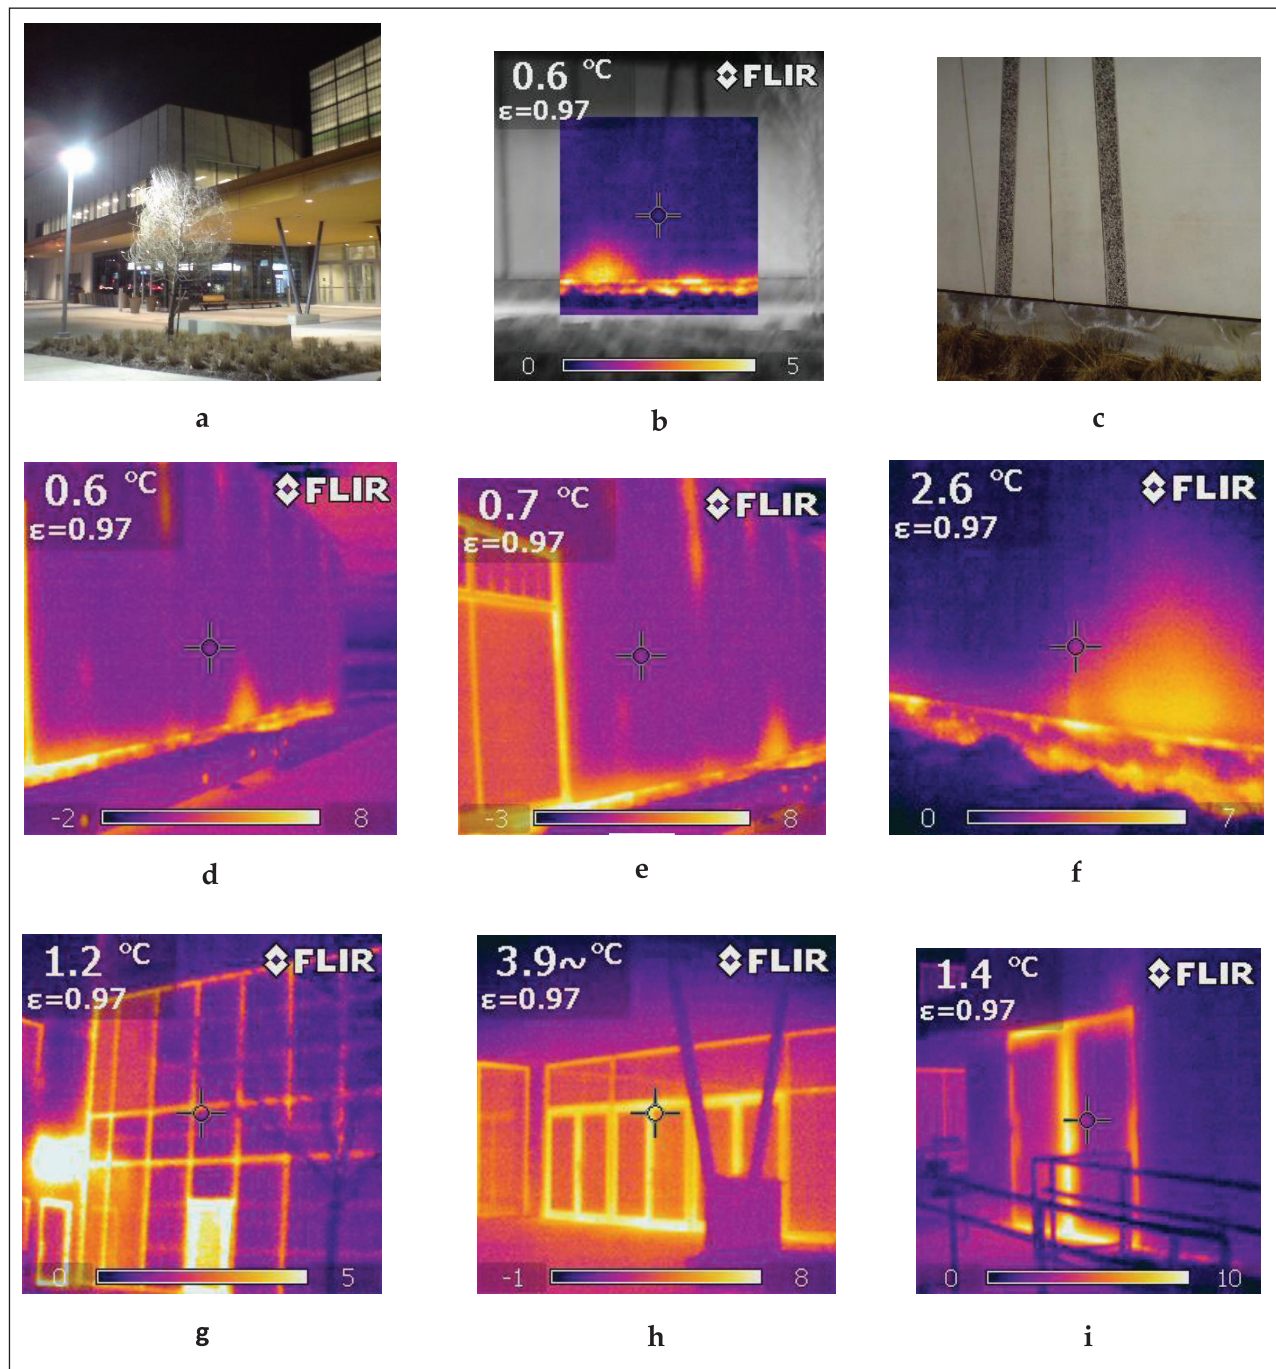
(a) Building 3 – Pan Am center (swimming pool) (b) and (c) effect of moisture on heat loss and thermal bridging (d) IR outside the swimming pool showing thermal losses through the concrete precast curtain wall, from (g) to (i) thermal bridging through the glass curtain walls (by the author).
